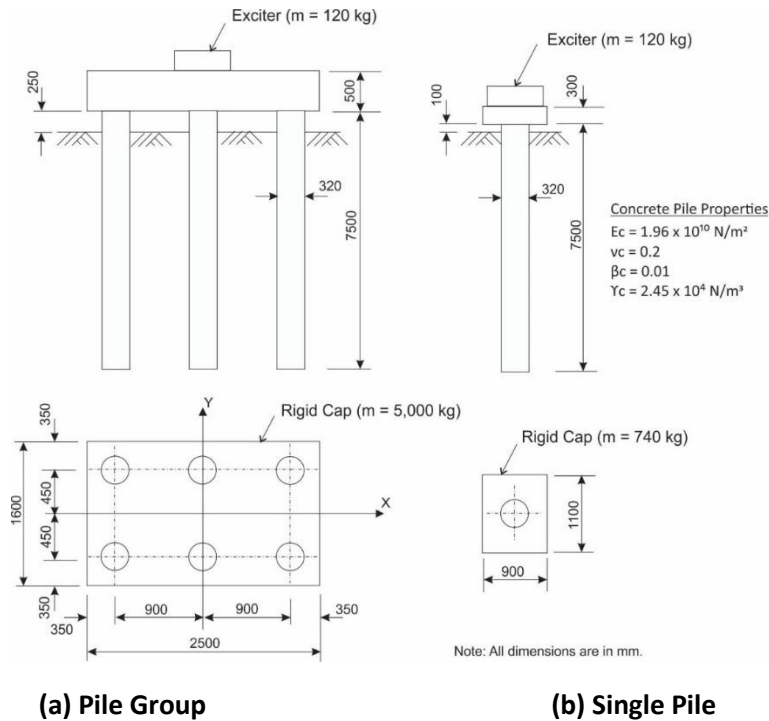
Layout of Single Pile and Pile Group for Concrete Pile Tests
